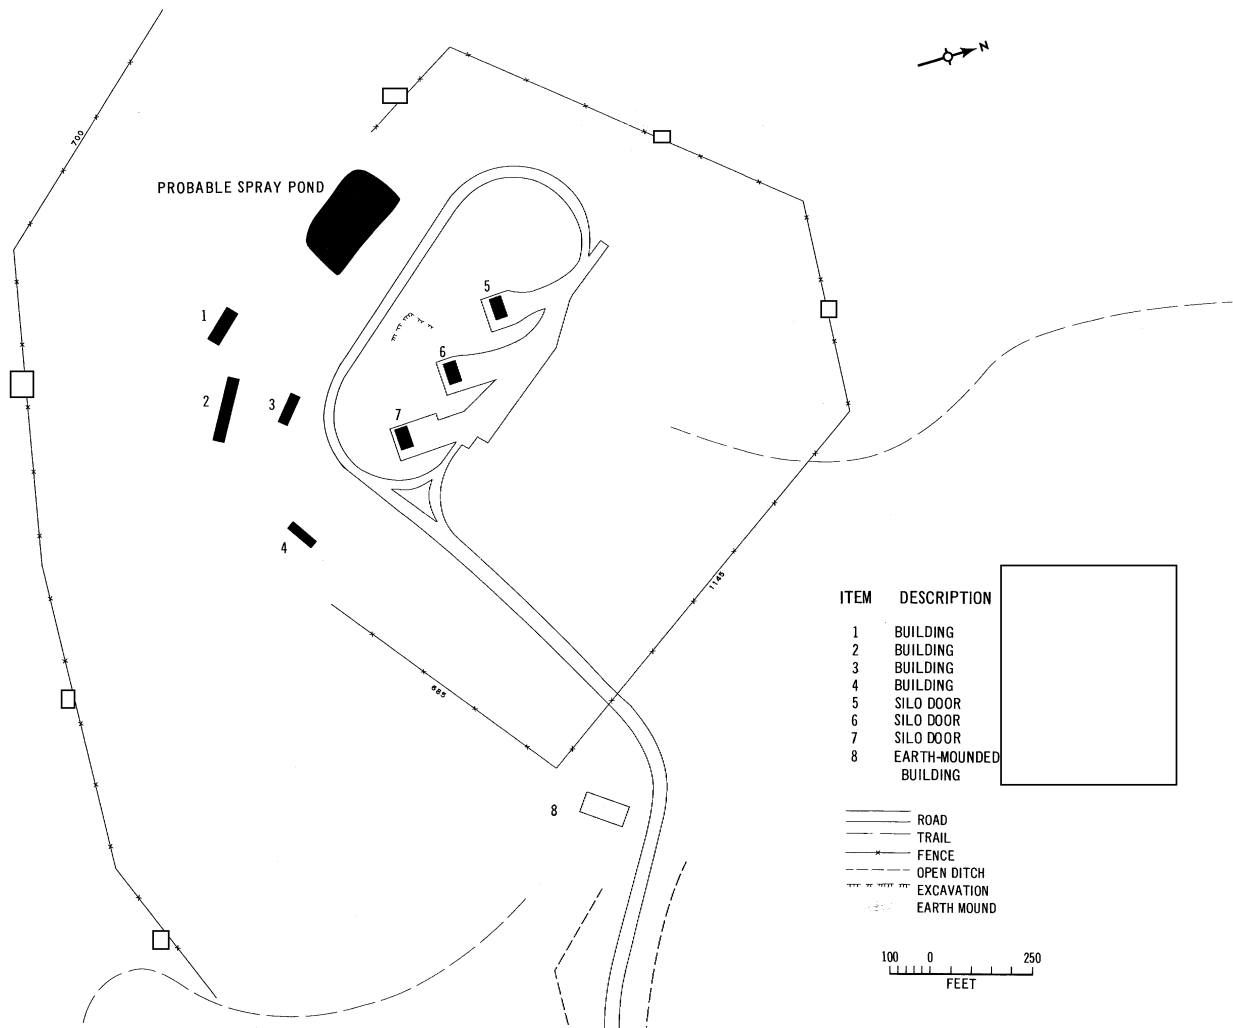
LAYOUT OF LAUNCH SITE 2.
